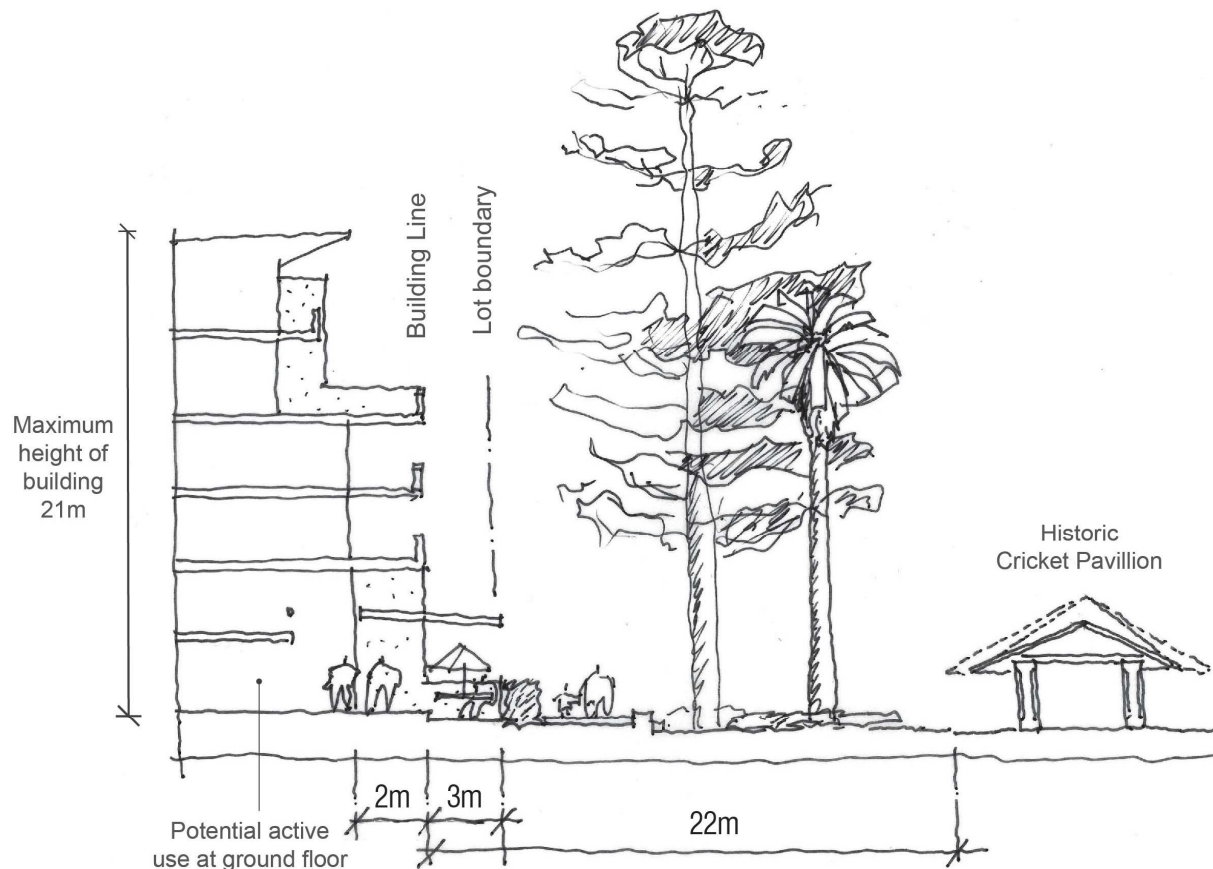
Lot F3 and Open Space 3 Section
